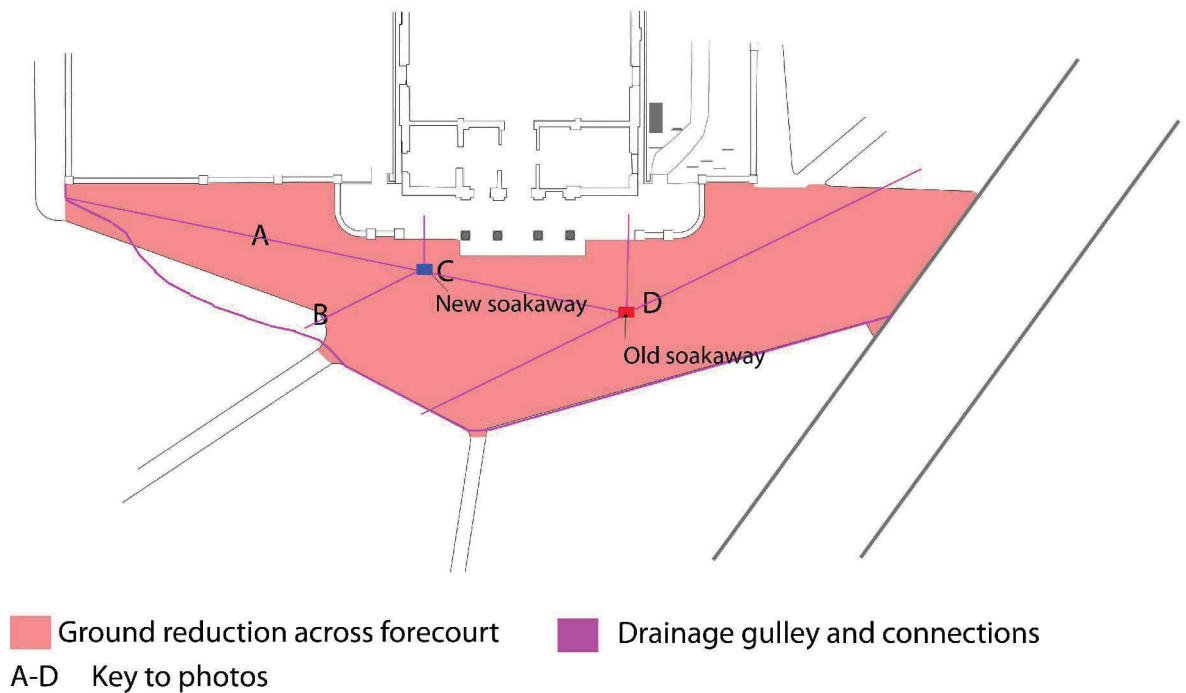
Drainage works in forecourt, based on plans provided by Child Graddon Lewis Architects & Design. Key to photos refers to Figure 5 below.
